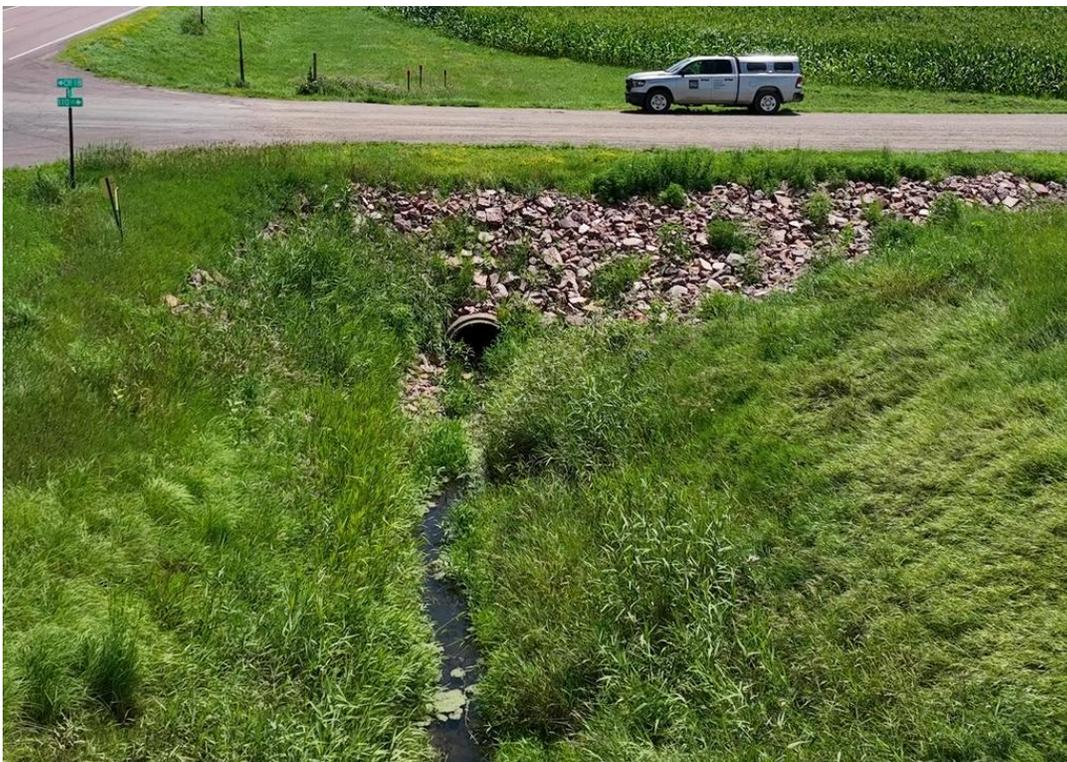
Downstream end of Branch 2A outlet at T-15 culvert crossing
